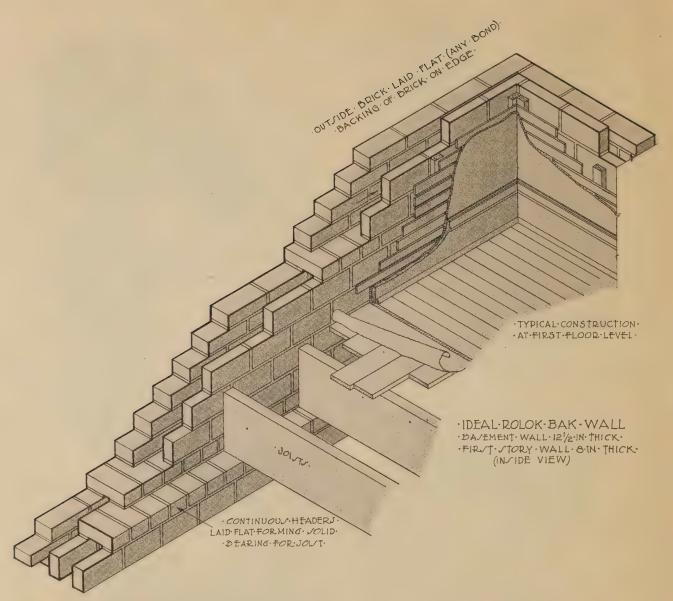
Typical construction detail at first floor level, 8" rolok-bak wall with 12" rolok-bak basement wa!l.
